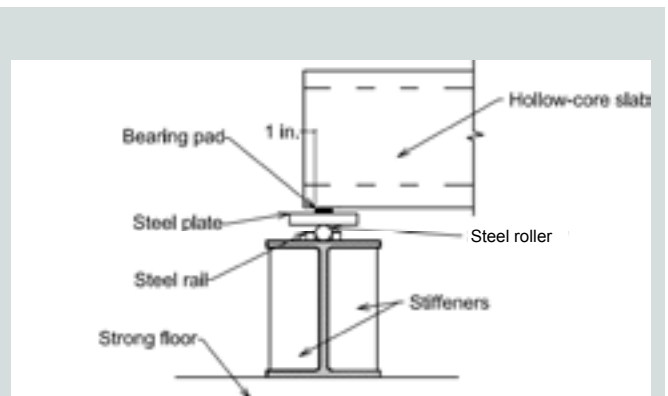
Pin support detail. Note: 1 in. = 25.4 mm.
